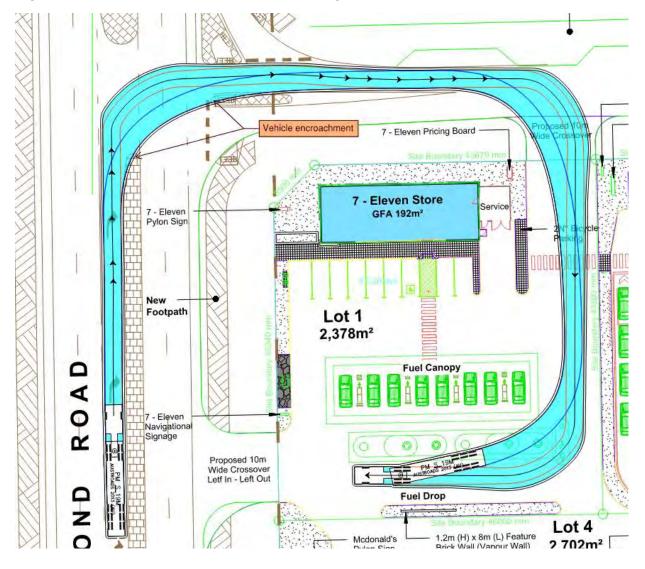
Swept Path – 17.2m Fuel Truck – Right In (Hammond Road North)
